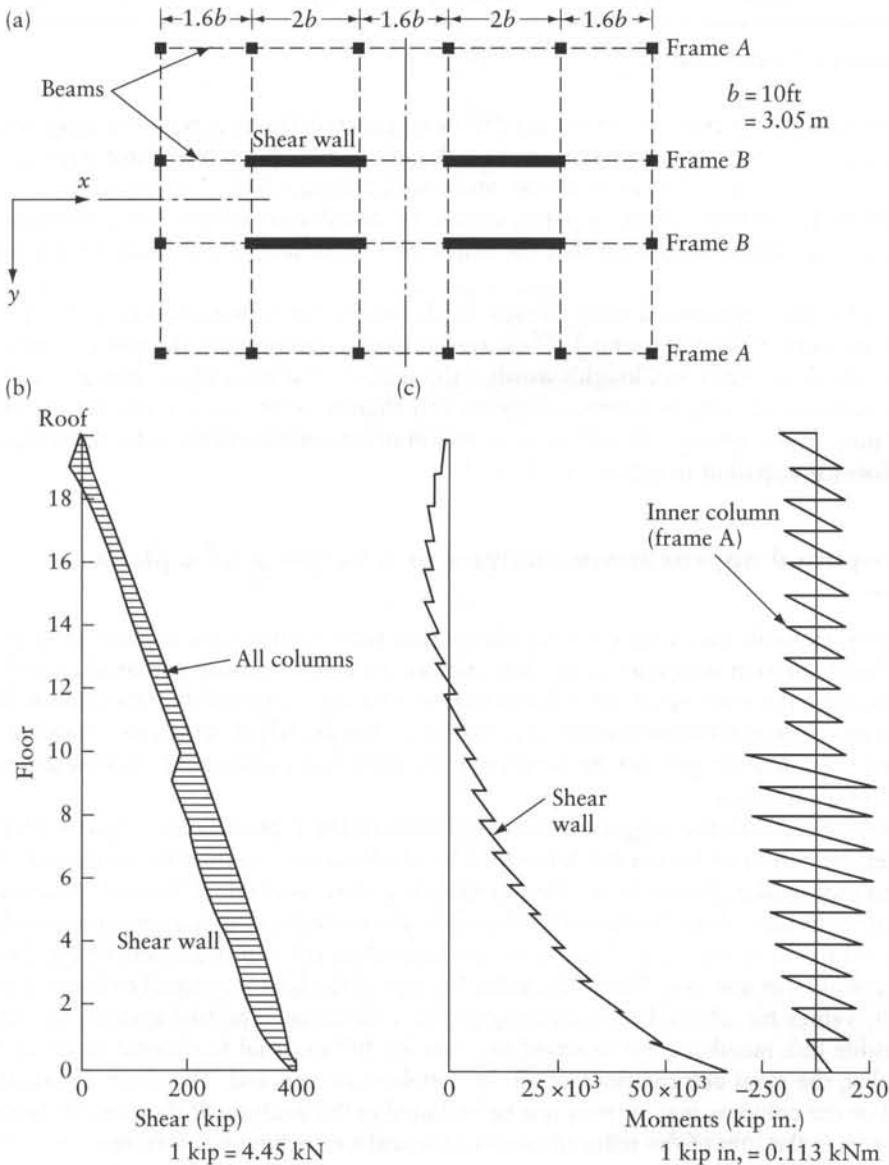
Example of a building analyzed by Clough, King, and Wilson. (a) Plan. (b) Shearing force distribution. (c) Moments in vertical members.
